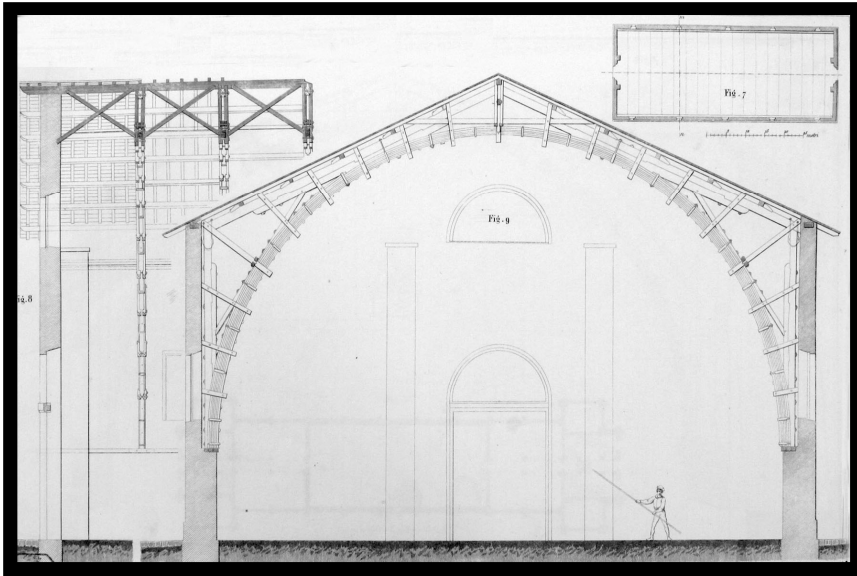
Plan, cross and longitudinal sections of Marac's barrack (Emy, 1856, reference plate: 102)
